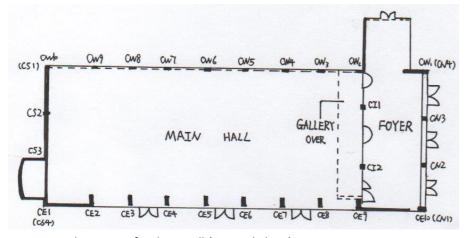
Plan View of Wilson Hall (Ground Floor)
